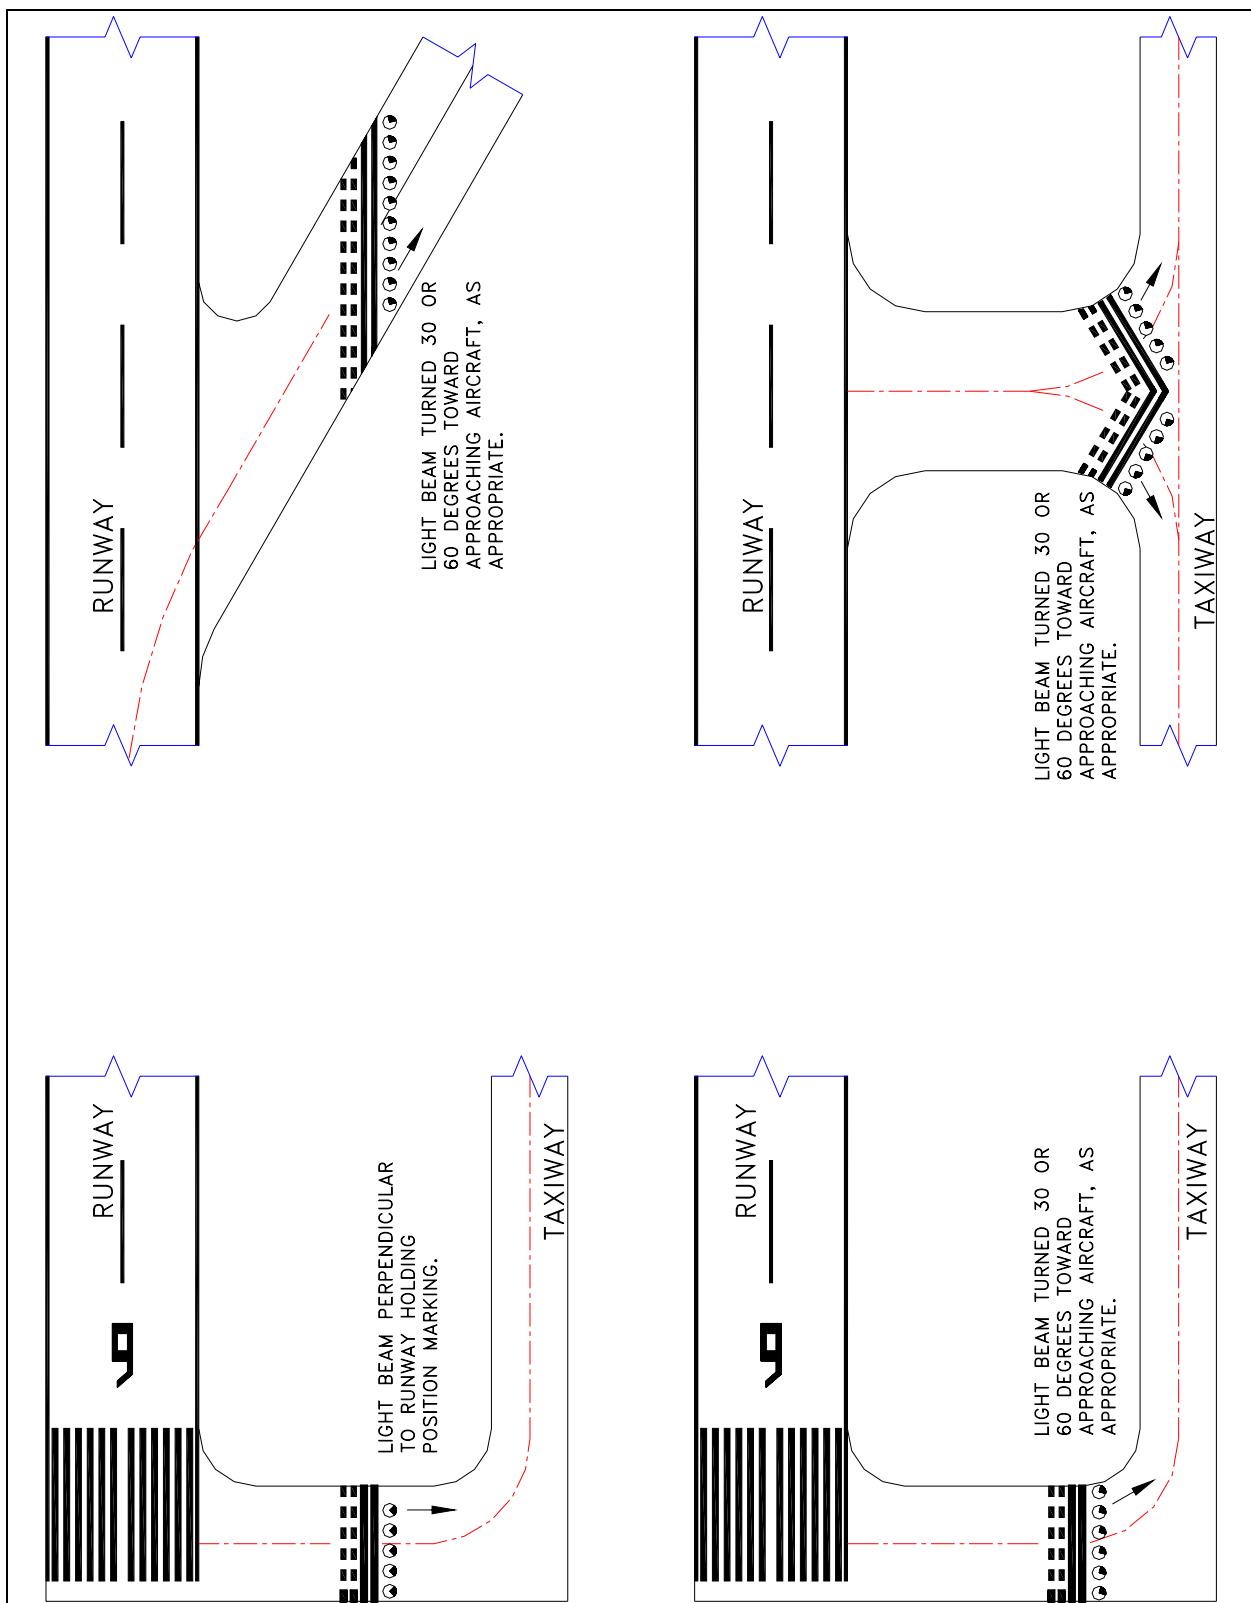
Typical Light Beam Orientation for In-Pavement RGLs and Stop Bars
